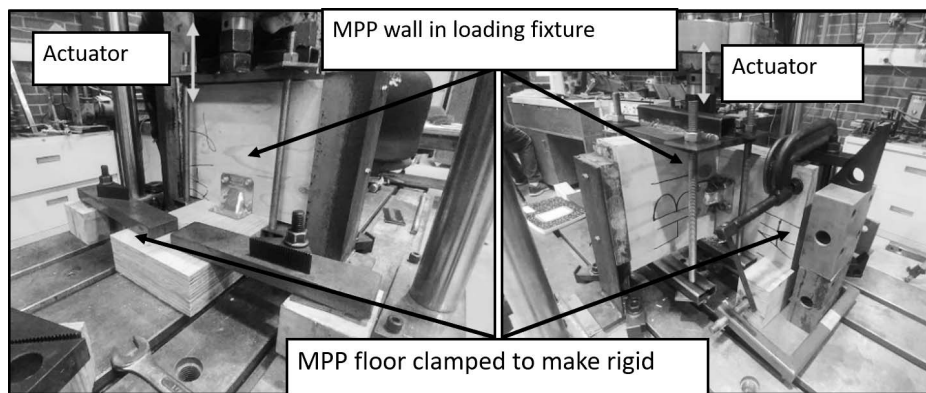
(Left) withdrawal direction testing setup; and (right) shear direction testing setup.
